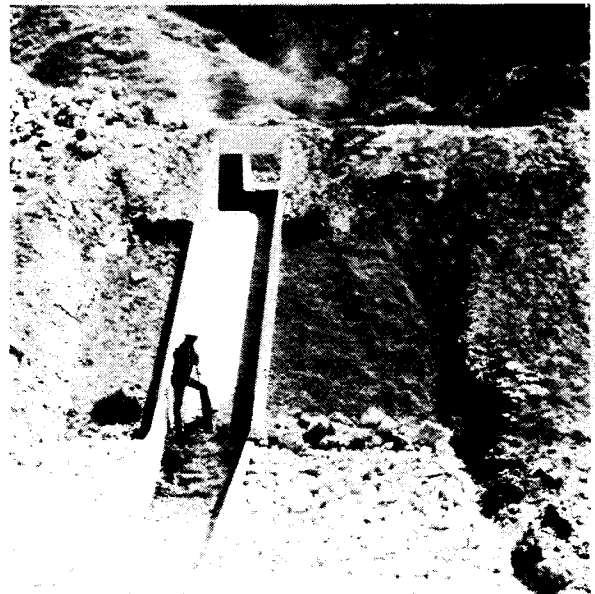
Rectangular inclined drain inlet to earth section. Erosion protection incomplete. P-707-729-1550
